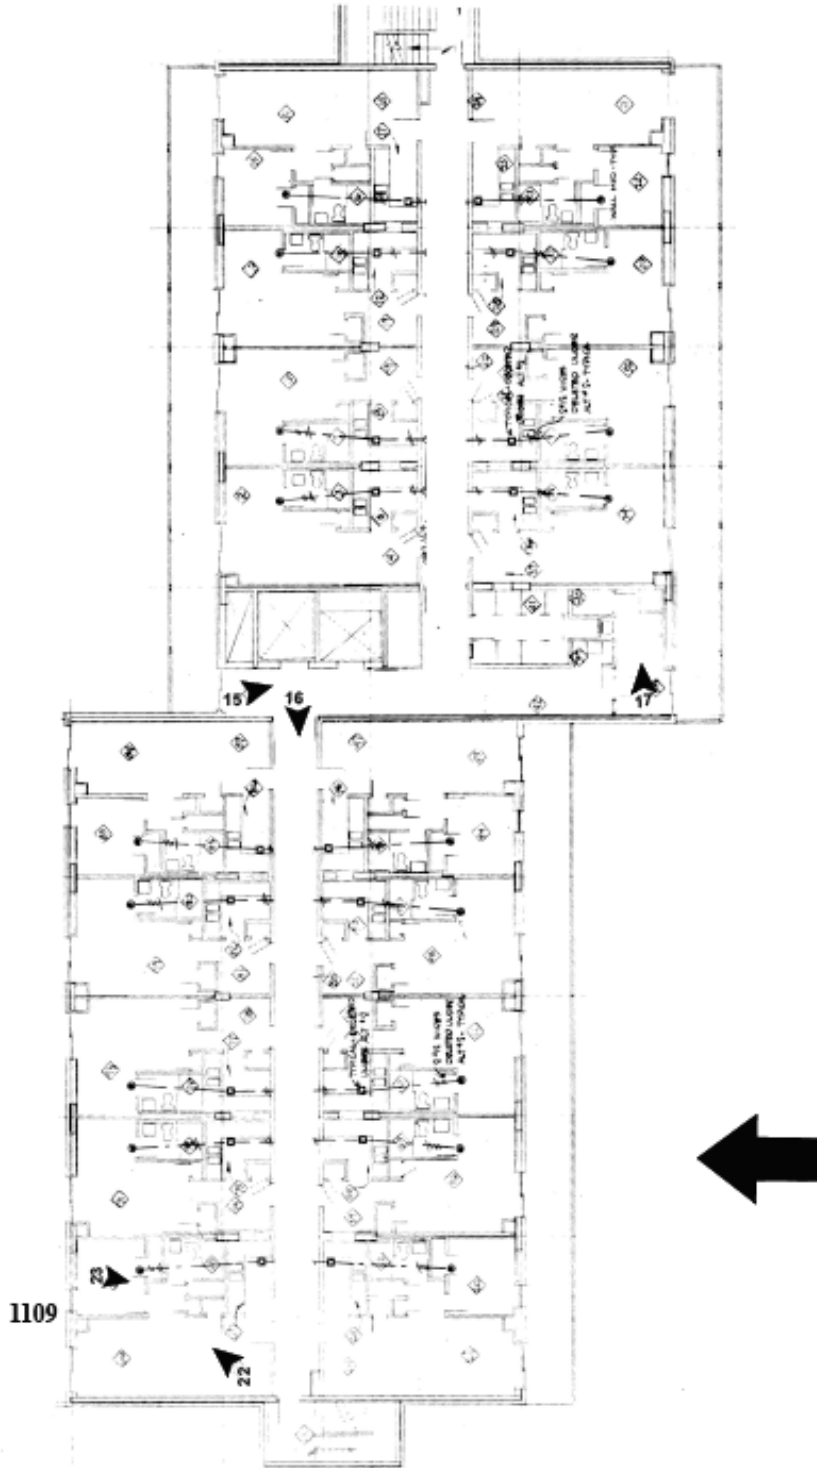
Interior Sixth Floor Photo plan. (typ. efficiency studio). Not to Scale.
